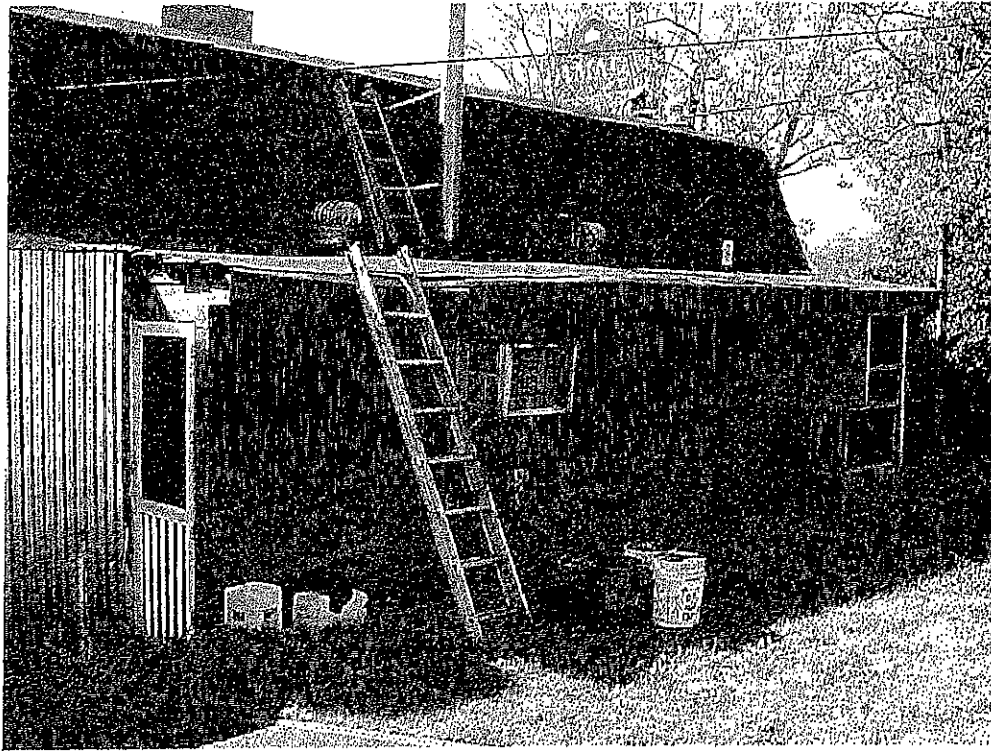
Exterior area of north side of Hunan Chiene Restaurant.
